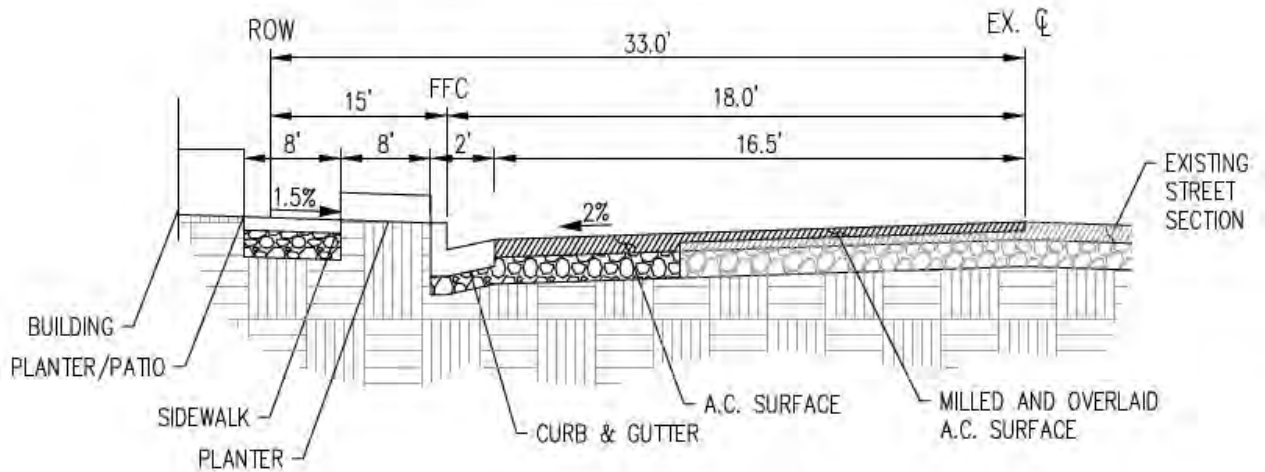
Sidewalk Sections (complete set of sections included on attached site plan)
